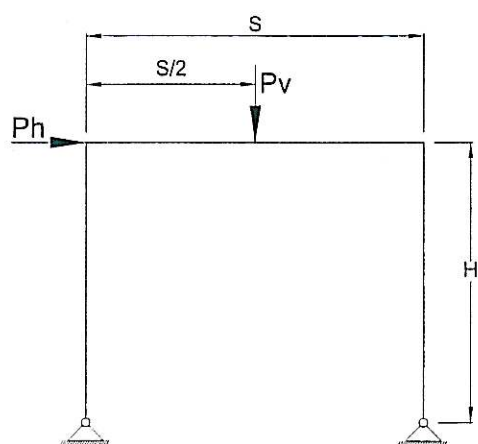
(a): VERTICAL & HORIZONTAL DECK LOADS
